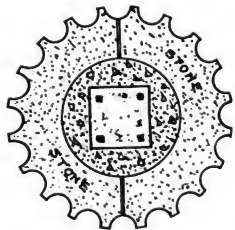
SECTION OF COLUMN SHOWING REINFORCED CONCRETE CORE.
